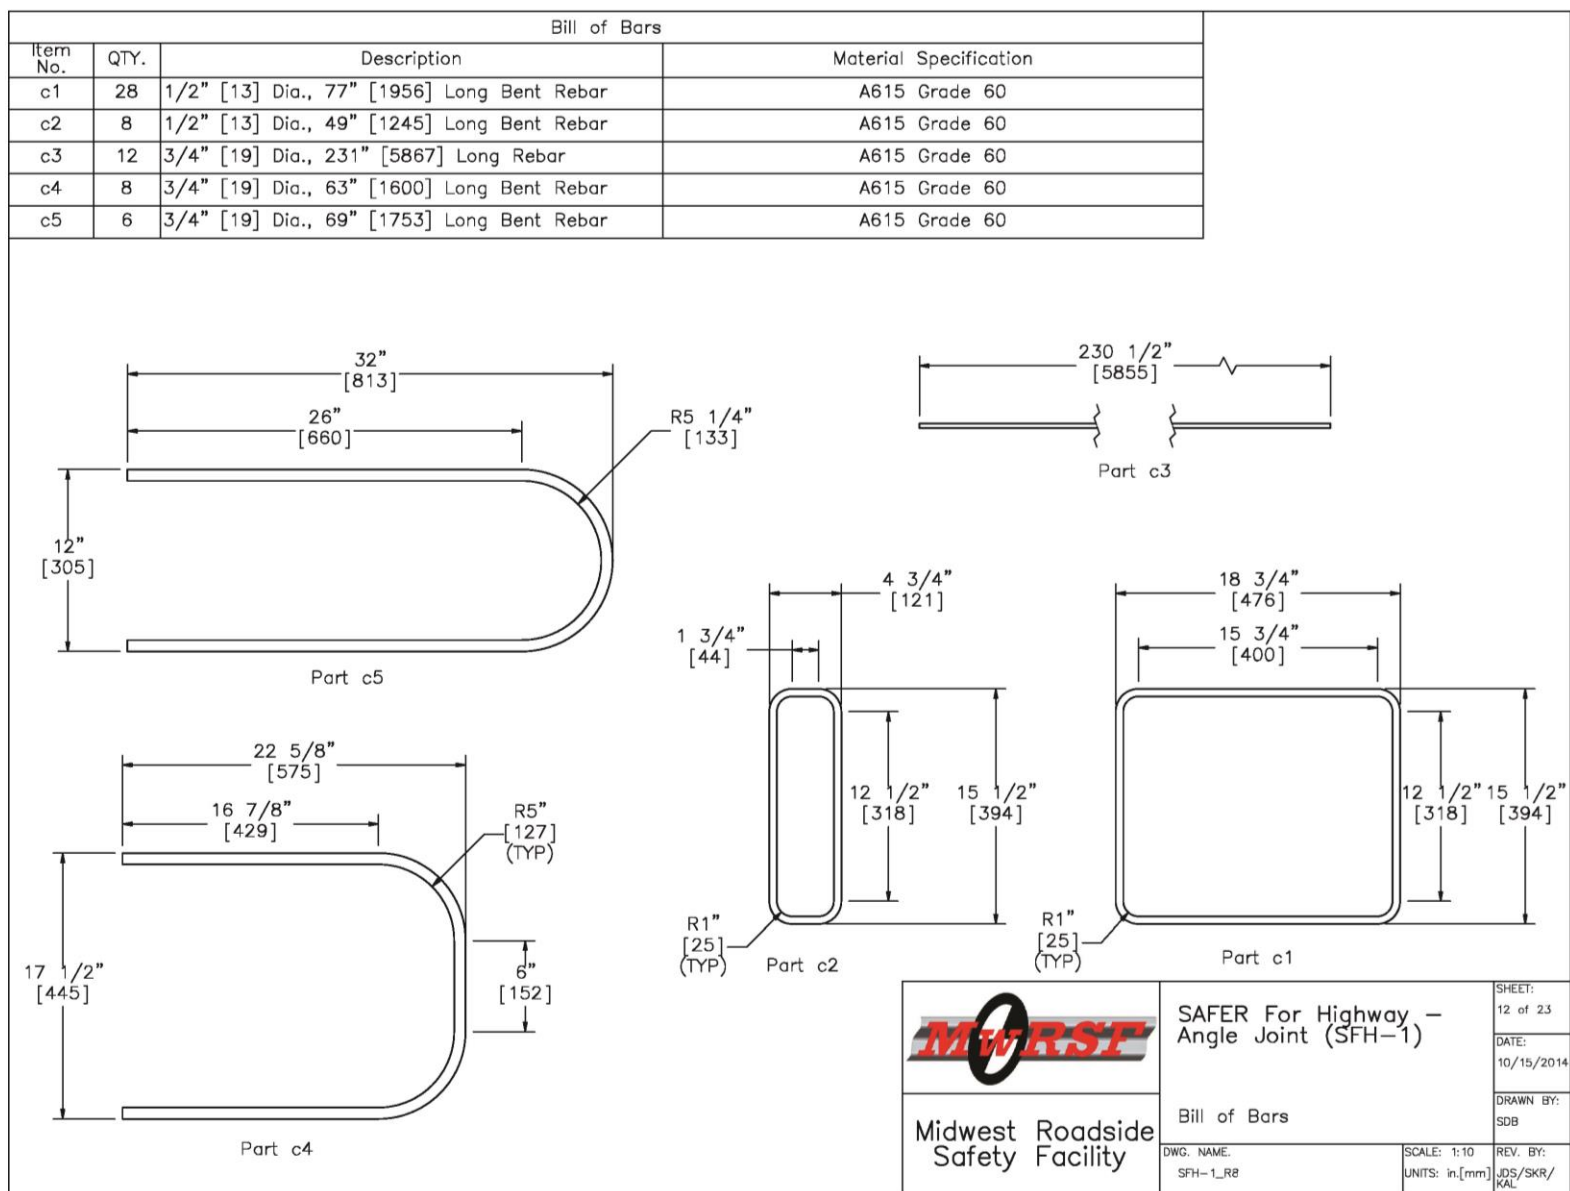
Recommended Barrier Design for Full-Scale Crash Testing, Bill of Bars
